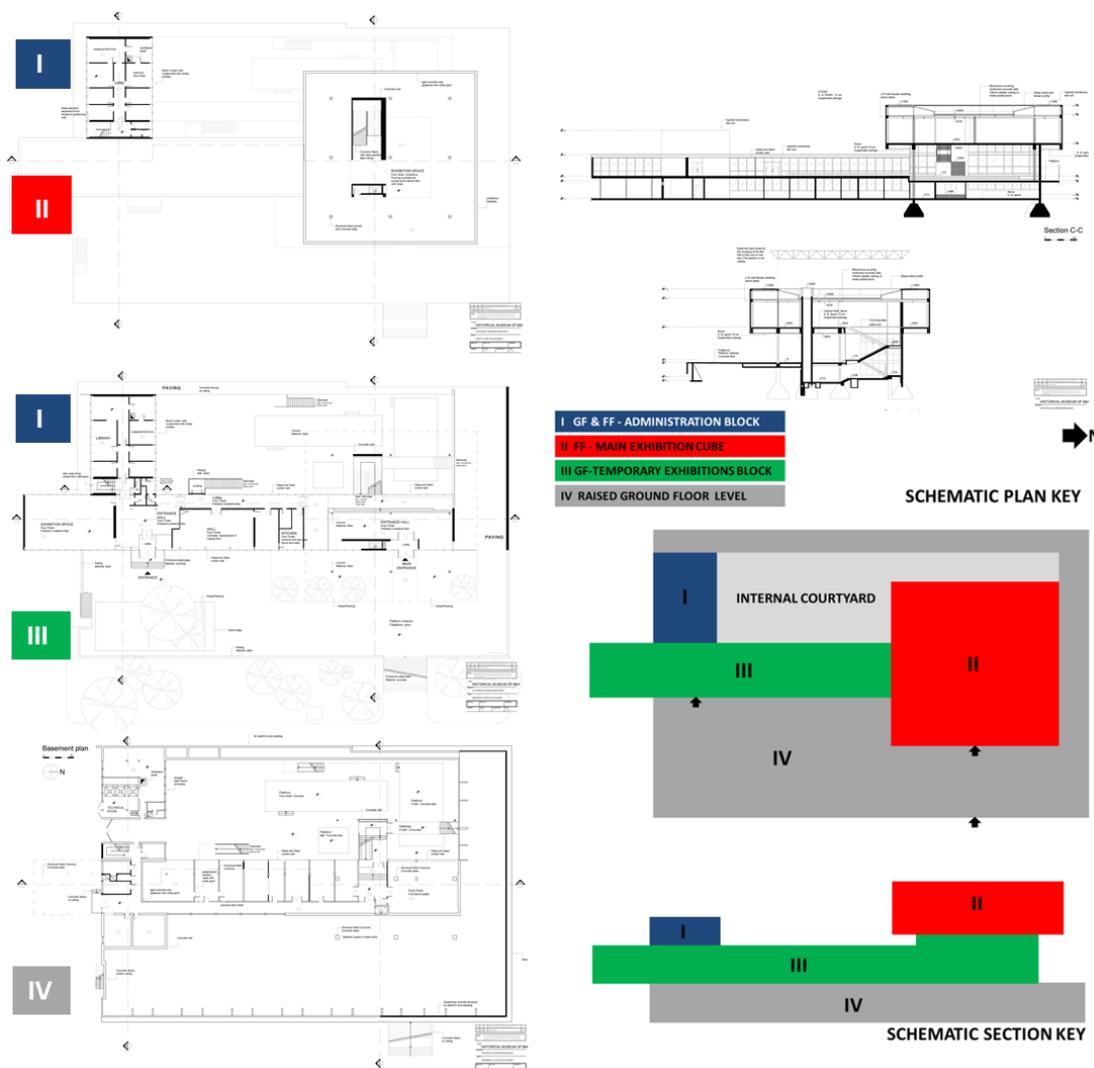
Museum of Revolution: Plans (left top to bottom: FF, GF, Basement), Sections and Schematic plan and section key; Adapted and annotated by Selma Harrington (Source: GCD Group Student project 2014, Author's archive).
